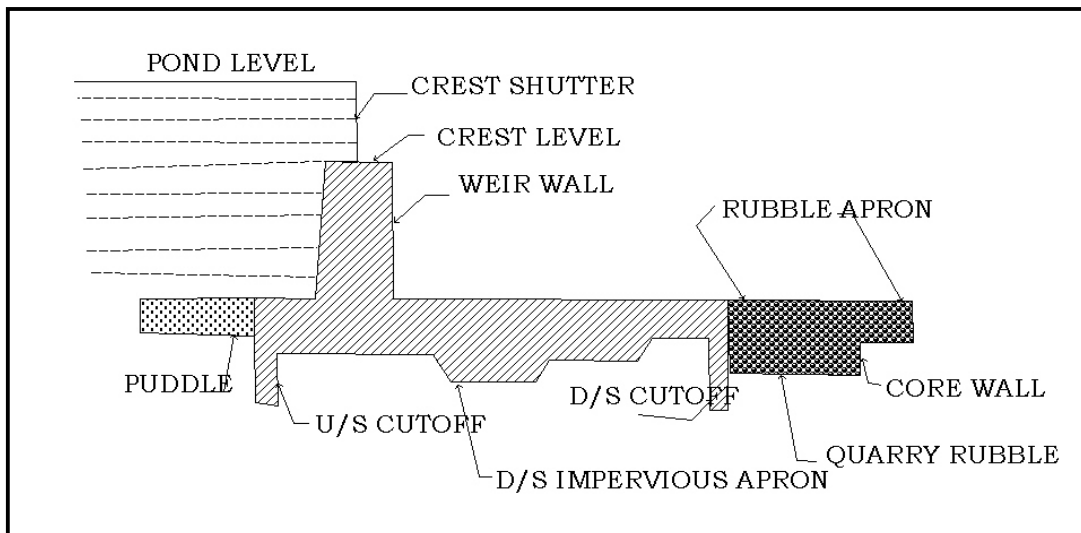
(a) A Typical Masonry Tank Weir with a Vertical Drop.
